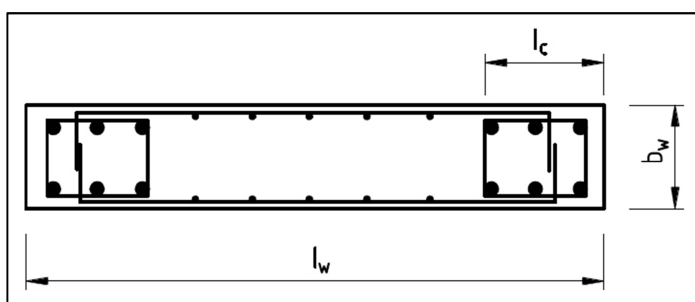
Reinforcement layout of structural wall section (SANS 10160-4, 2009, p. 38)
